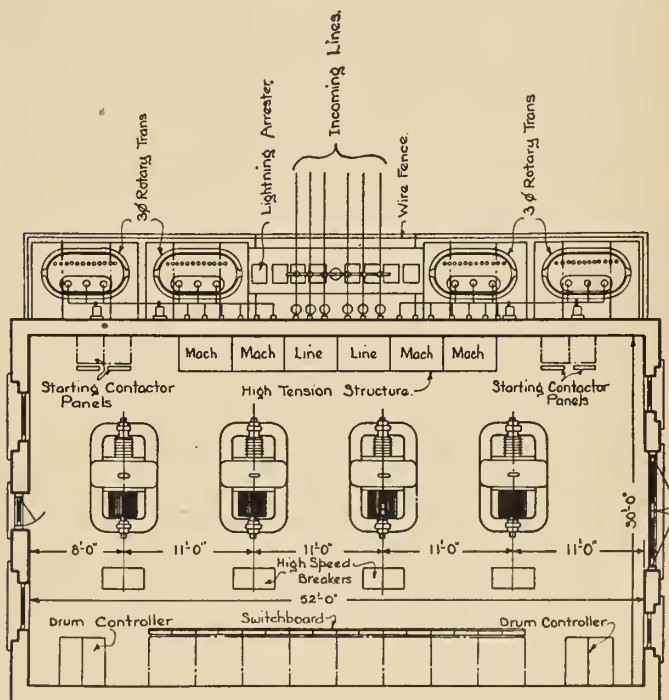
, — Main Floor plan of 4-unit automatically Operated Station.
